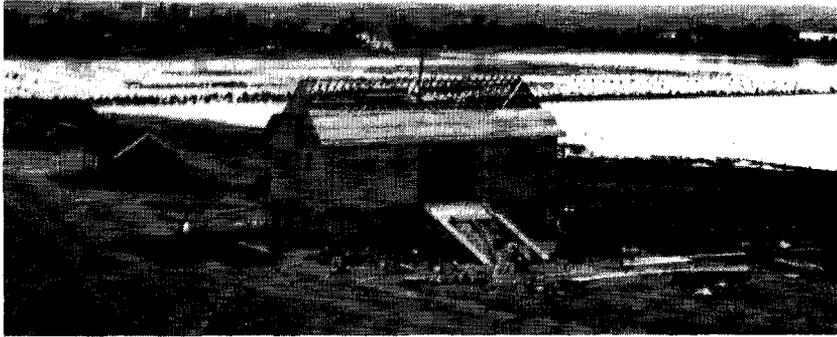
Barn under construction July 14, 1907, with Big Creek in flood. This building with stone basement cost \$4,400 and was constructed to replace the barn that burned.
